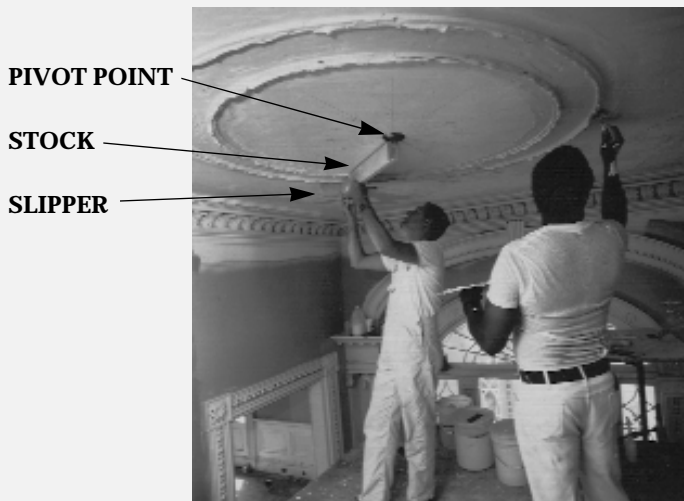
Fig. A. First, a plain-run surround is spun from a pivot point centered in the ceiling field. Photo by Peter Sanders.
